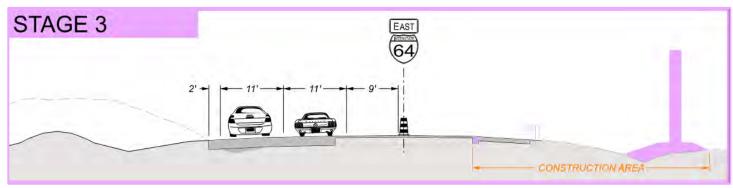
TMP Typical Sections, Stage 3
